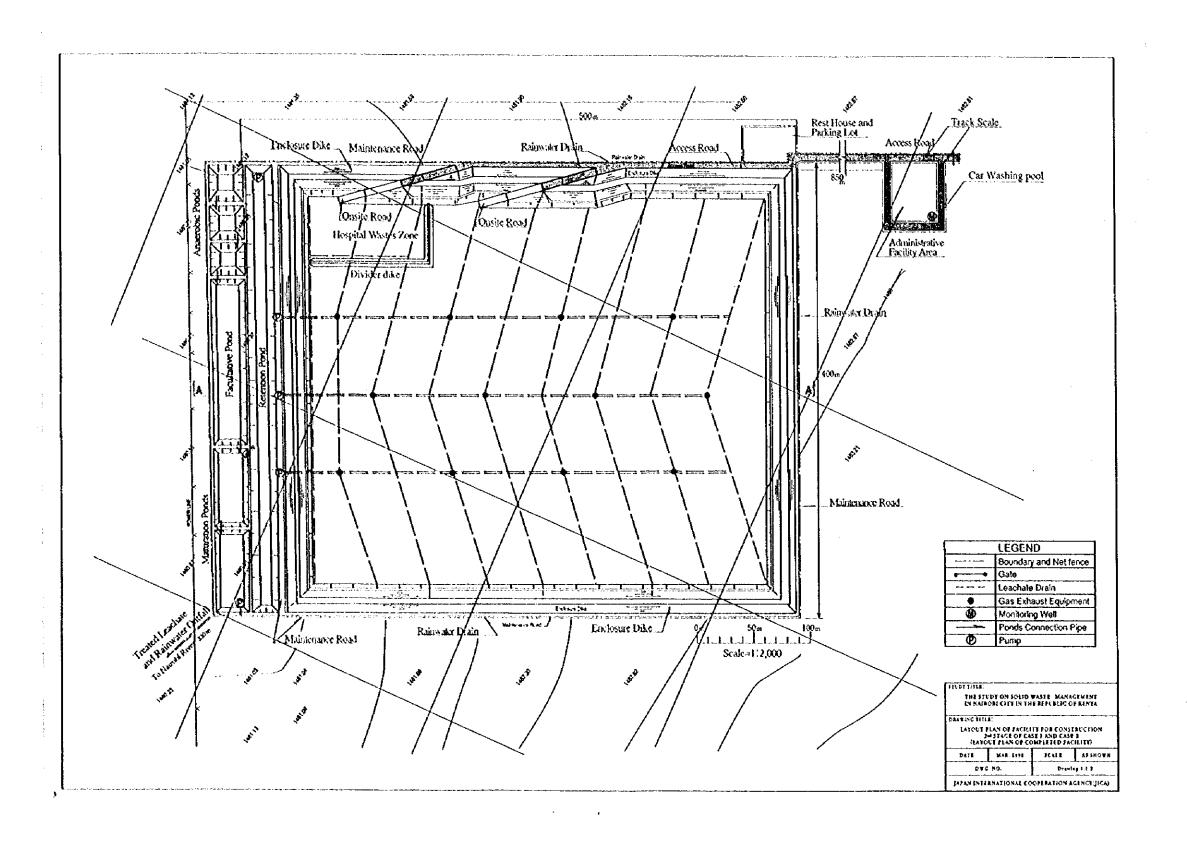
LAYOUT PLAN OF FACILITY FOR CONSTRUCTION 151 STAGE OF CASE 1 AND CASE 2
